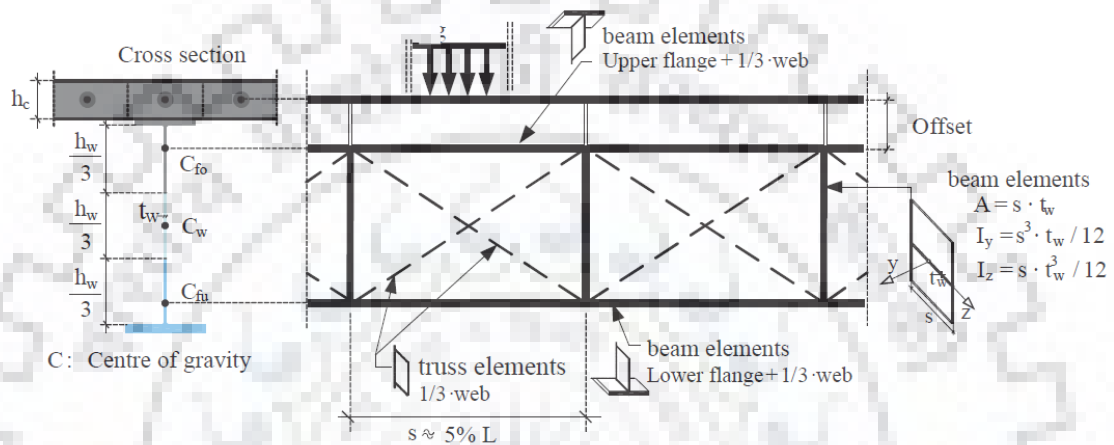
Truss idealization of a steel-concrete composite girder (Vayas et al. 2010)
